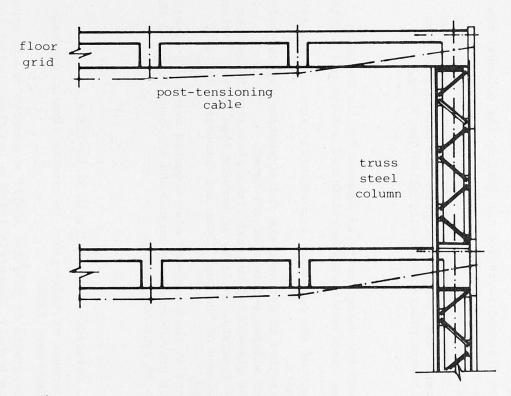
Final strengthening scheme (truss steel columns and post-tensioning cables)
